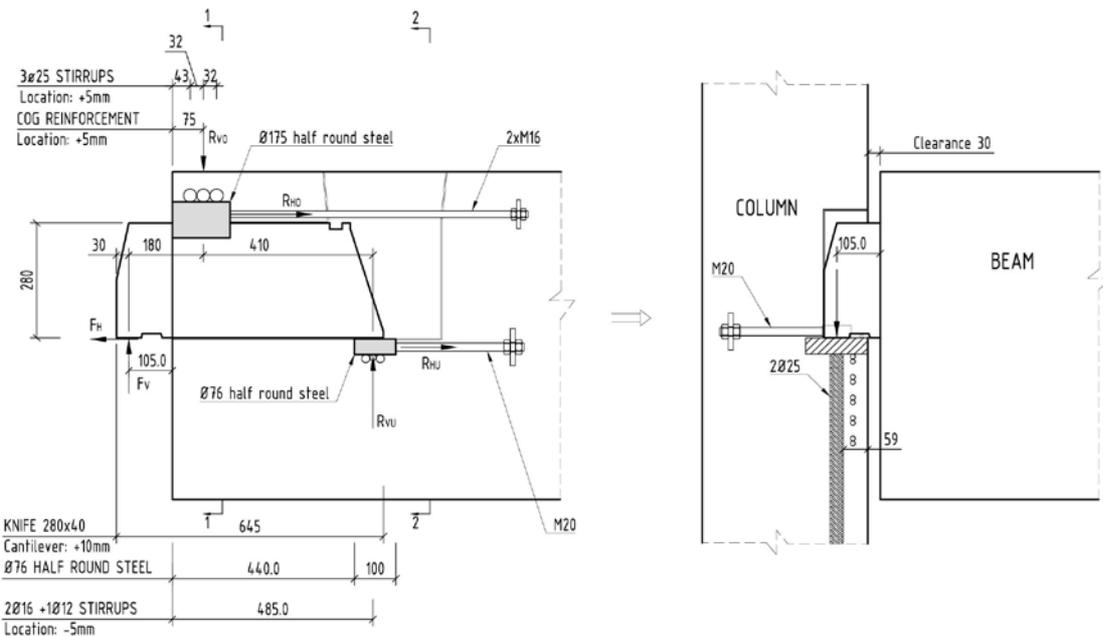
BSF 700 Beam unit. Situation II-unfavourable tolerances on cantilever and location of anchoring reinforcement.
